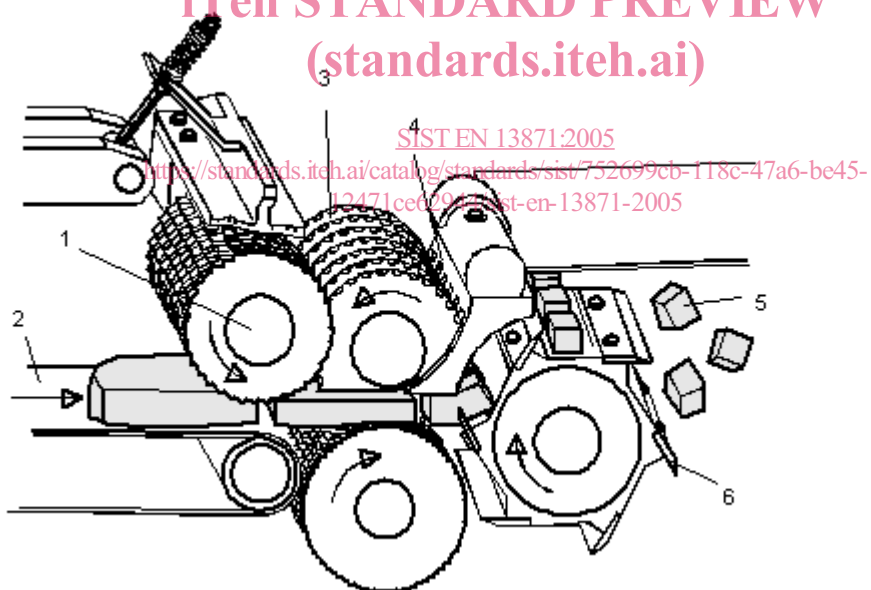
Cubes cutting machine type with various blades, conveying unit and feed conveyor
